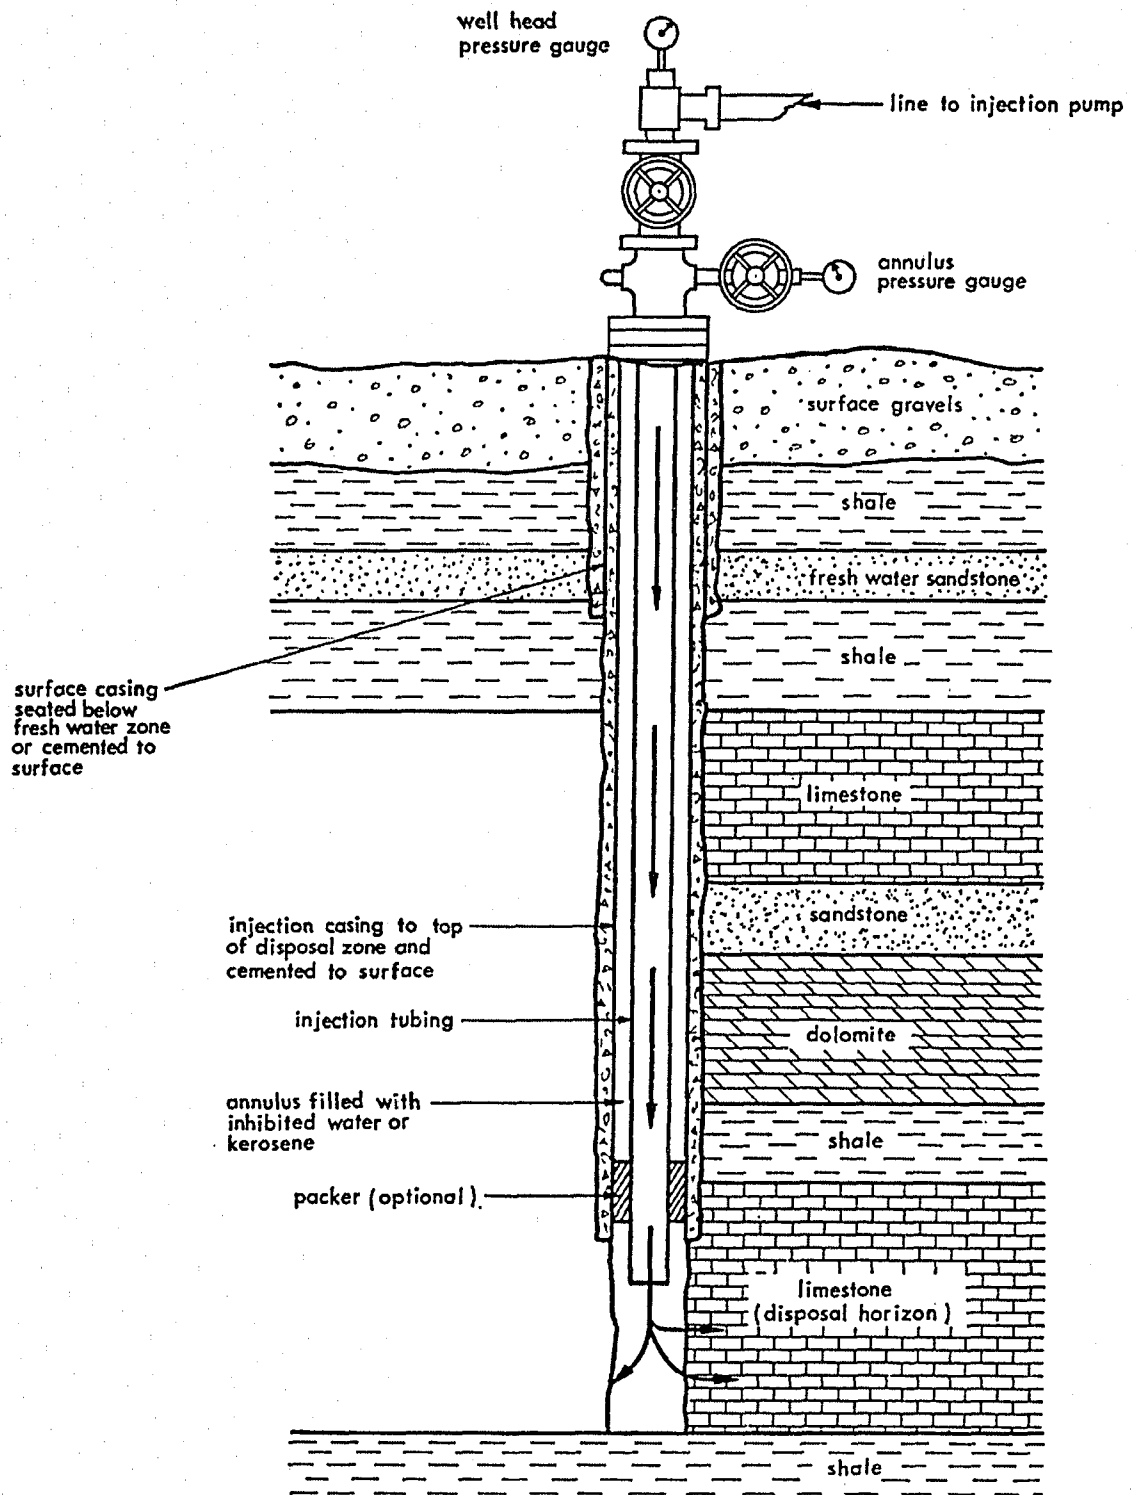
Typical disposal well construction (from McLean, 1968).
